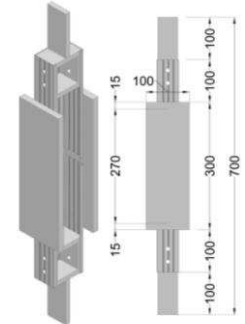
Test set-up for shear tests on panel-to-frame connections
